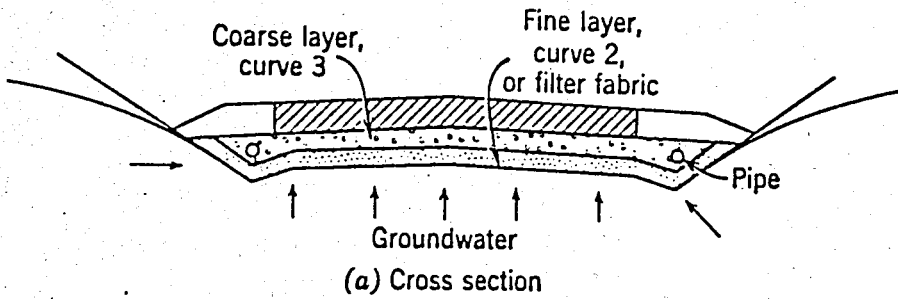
DESIGN OF HIGHWAY ROADBED.
